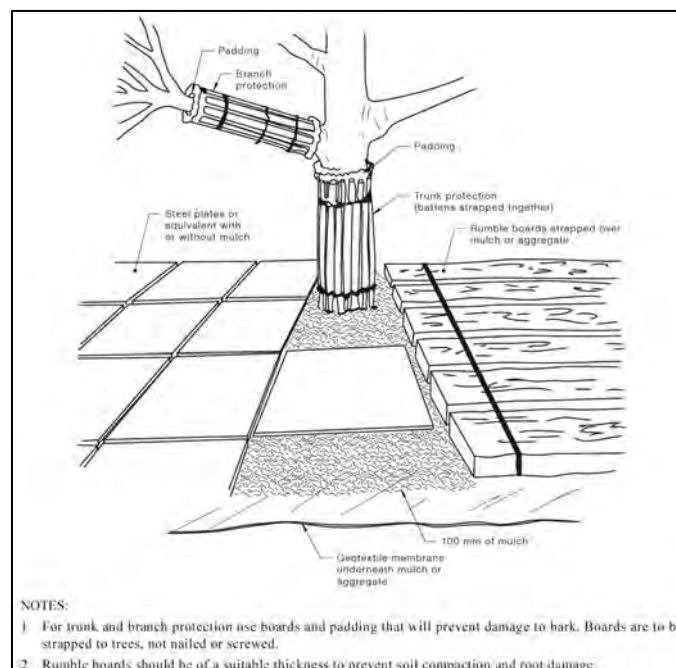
Trunk and branch wrapping as well as rumble board specifications. (Source: AS 4970:2025).
